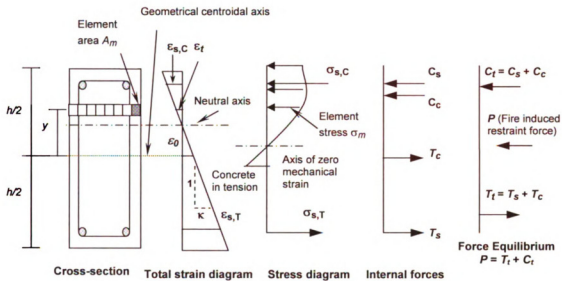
Variation of Strain, Stress and Internal Forces in a Typical Beam Cross-section Exposed to Fire
